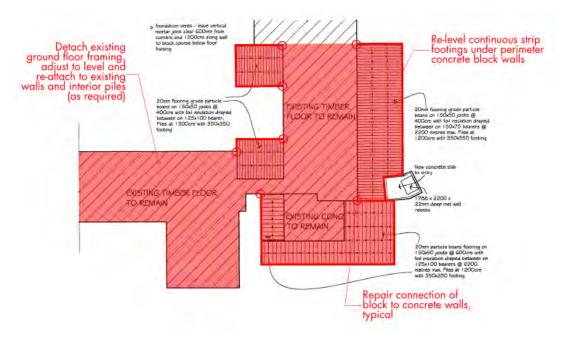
South Wing — Foundation / Ground Floor Plan — Repairs Required
